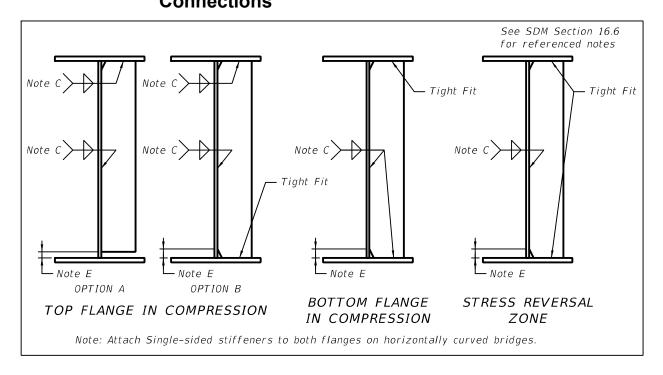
Details of Intermediate Stiffeners w/o Crossframe Connections
